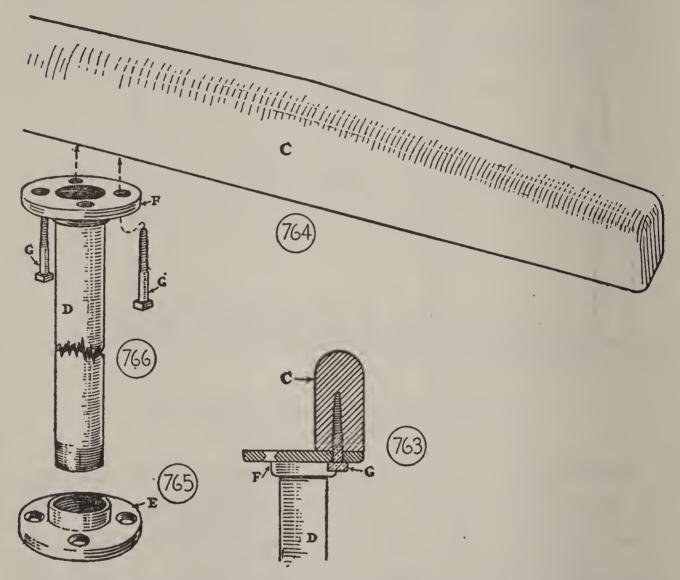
Cross-Section of Bar, Showing Pipe Floor-Flange Connection.
